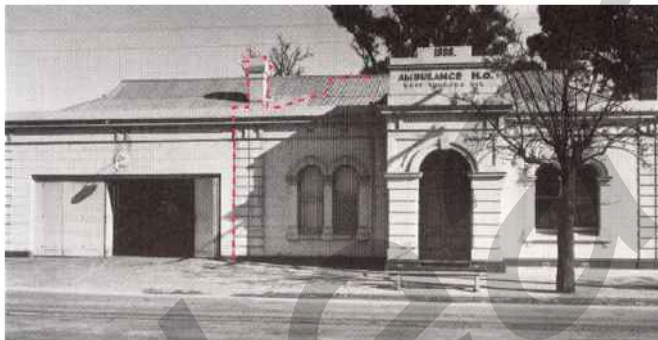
Photograph of c.1951 addition to Council Chambers Façade to Marion Road (with indicative original roof line)
